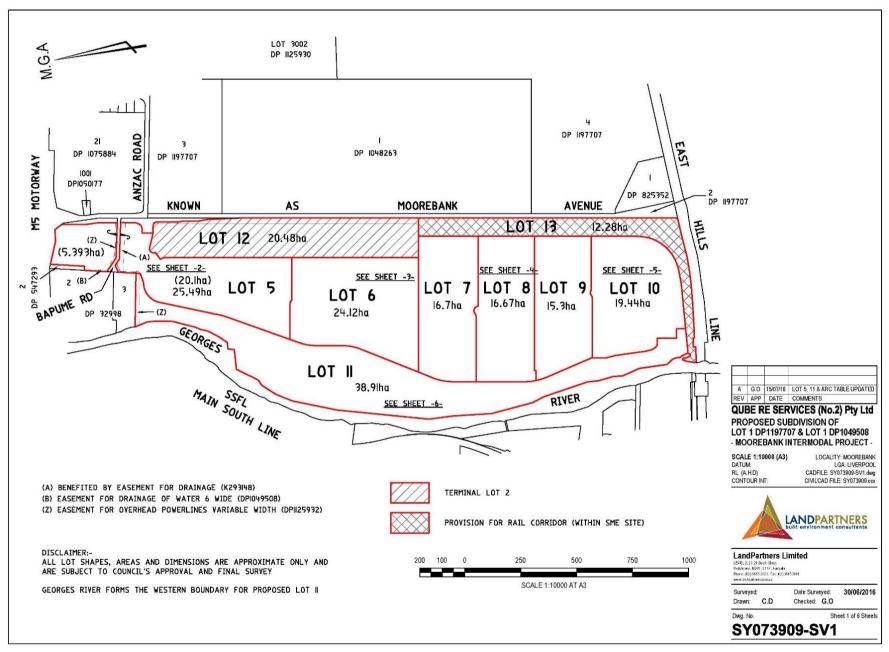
MPW Stage 3 indicative subdivision layout, subject to final design requirements (Land Partners, 2016)
